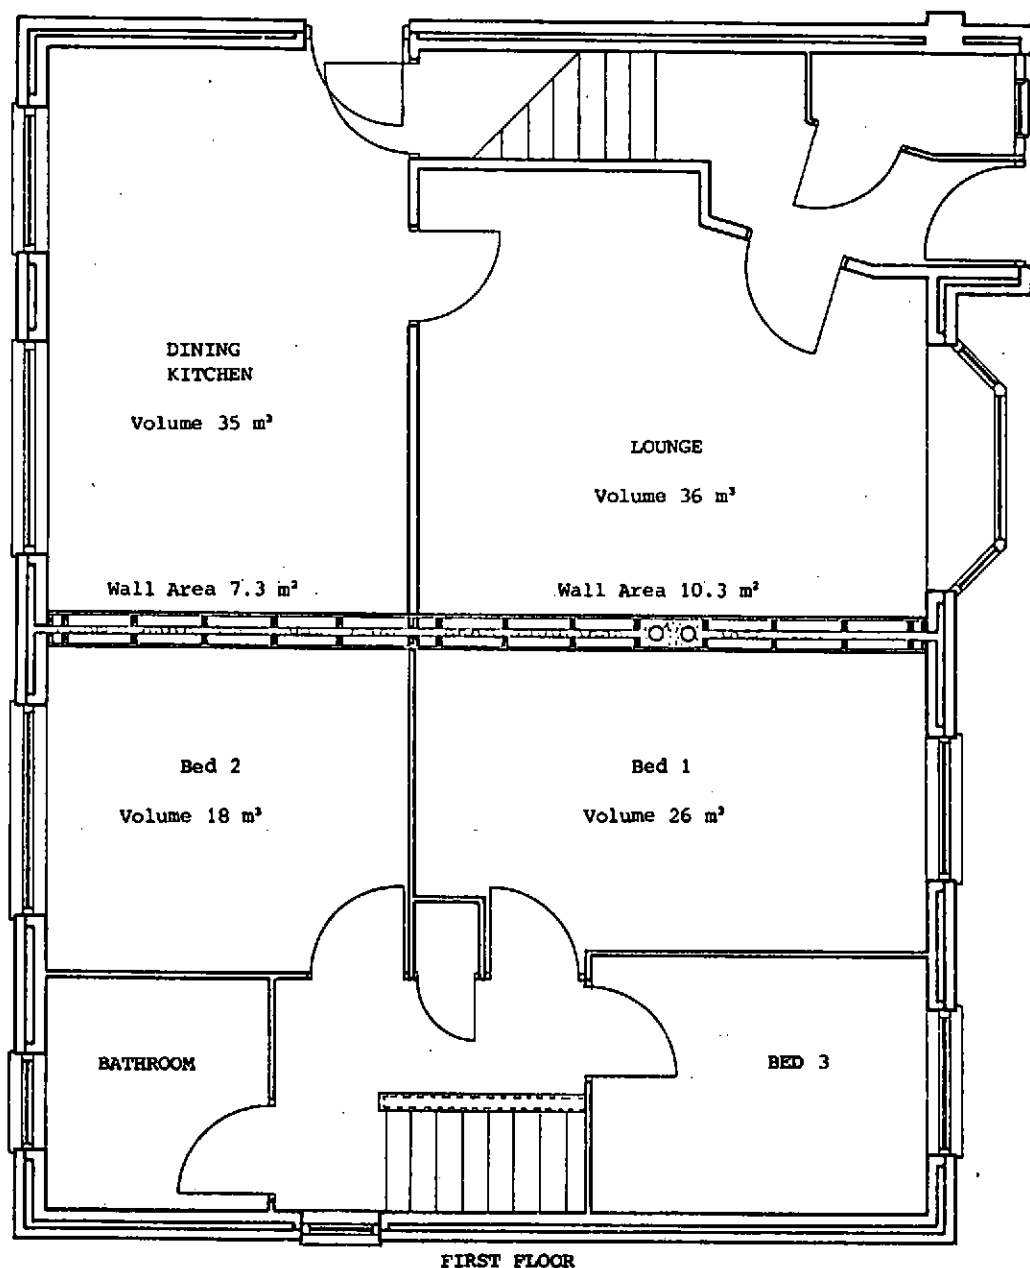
PLAN OF TYPICAL SEMI-DETACHED HOUSE PAIR SHOWING POSITION OF TIMBER SEPARATING WALL AND GAS FIRE FLUES.
